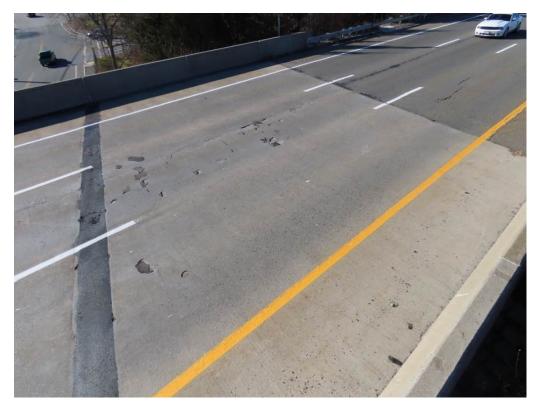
Overview of span 1 concrete wearing surface looking south. On the left, pier 1 plug joint.
